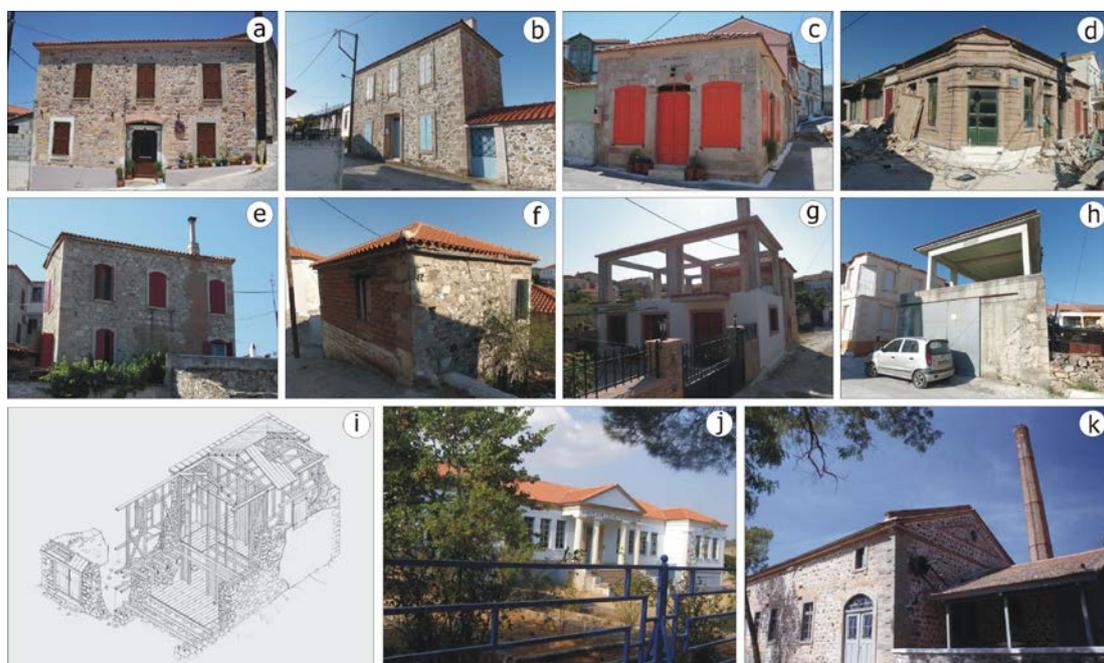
The dominant building types in Vrissa comprise masonry buildings (a-f) and R/C buildings (g-h). The masonry buildings constitutes the majority of the building stock of Vrissa. They mainly include massive stones (a-d) and mixed types including mainly massive stones and perforated bricks (e, f). Their construction is dated back to the late 19th or early 20th century after repeated destructive earthquakes of the 18th century and more specifically from 1845 to 1889. (i) Antiseismic structures with dual structural system were also detected in the affected area. (j-k) Special structures such as school buildings and industrial facilities were also observed.
